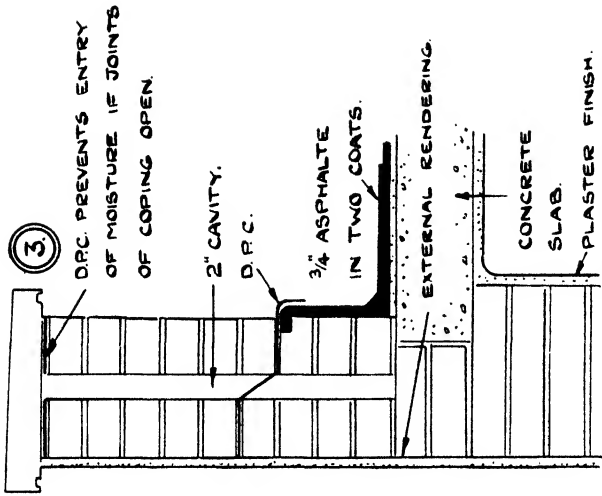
HOLLOW PARAPET WITH RENDERED EXTERNAL FACE
